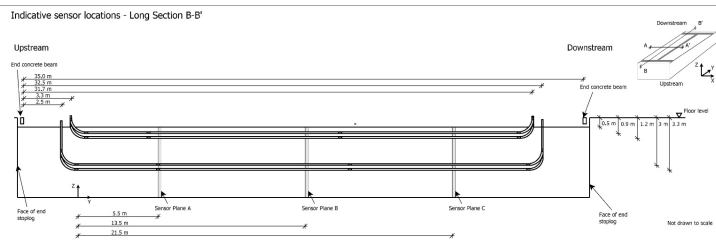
Lay-out of the ICAIR facility: vertical cross section parallel to the flow direction. The inset shows the layout in 3-D for reference.
